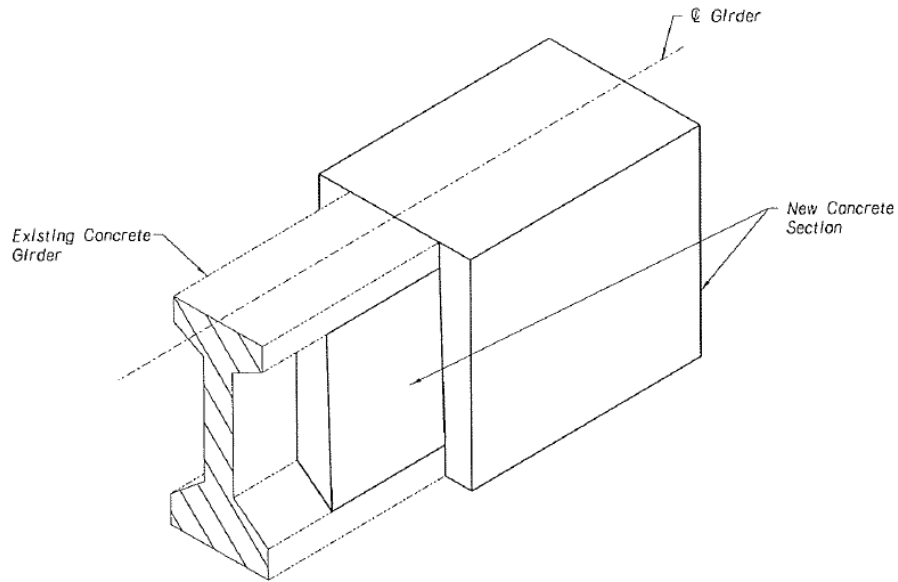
Isometric detail of girder end encasement on the 2015 repair works, from the repair documents of Kearney South Platte River Bridge, courtesy of NDOT
